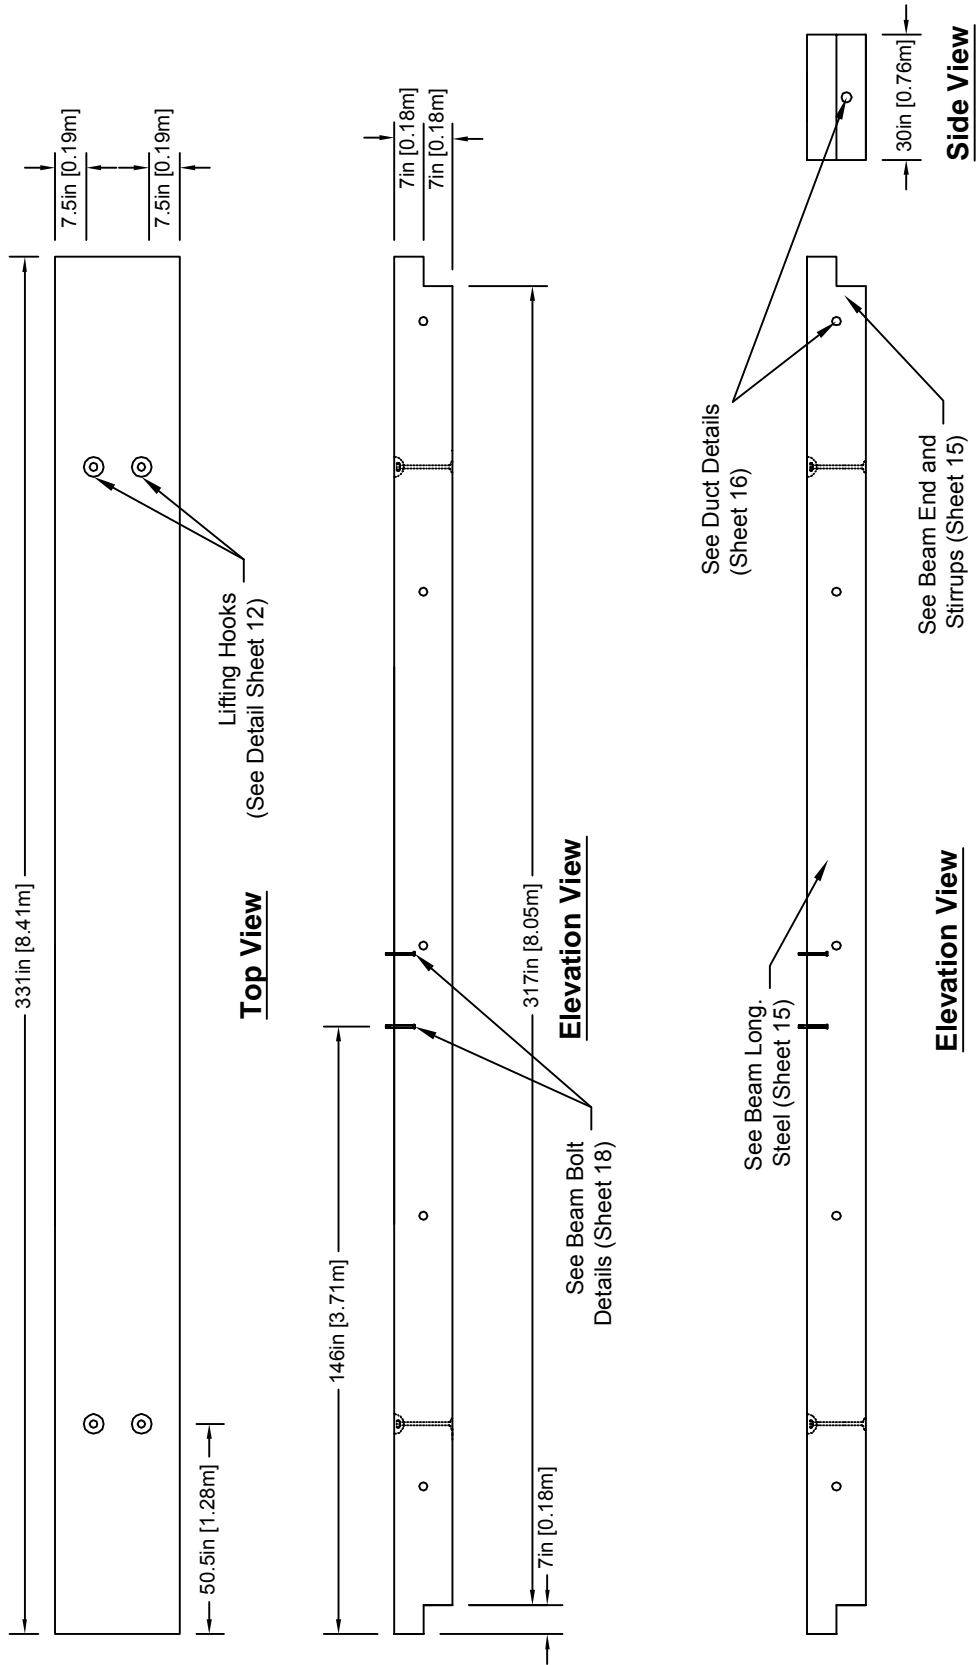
Bridge Plans Sheet 13; Beam Plans.
